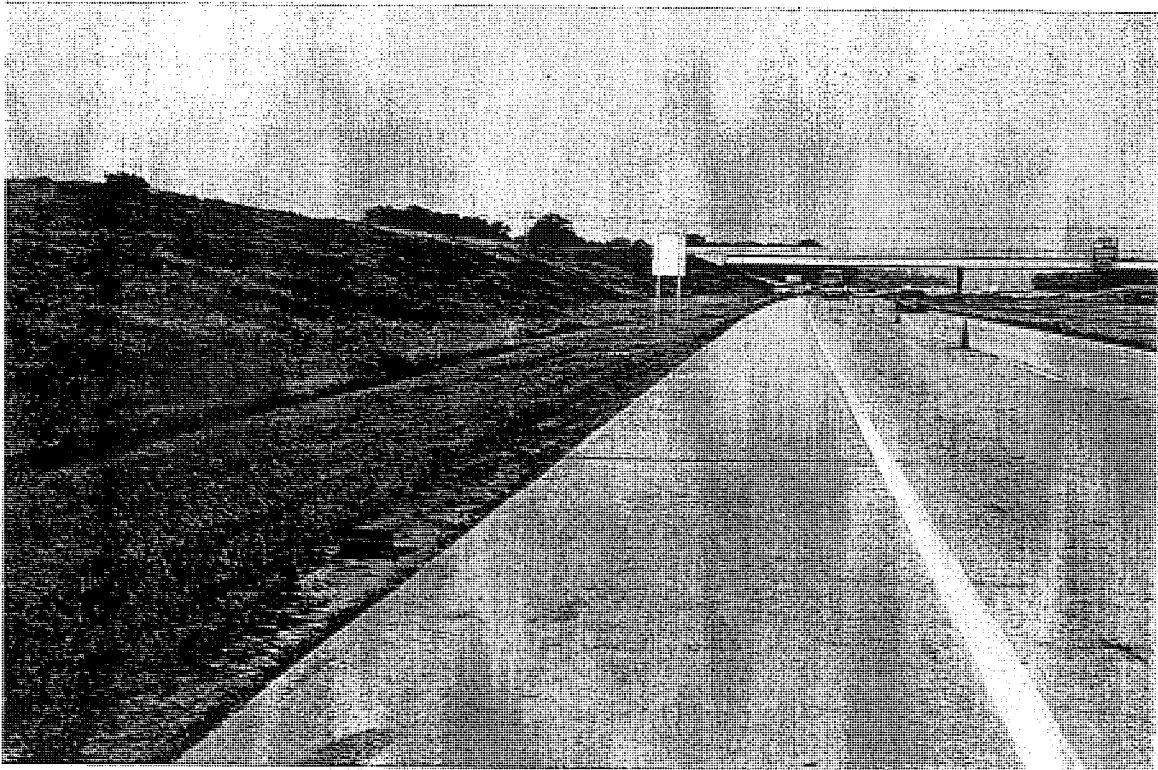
An overview of CSN# 19042-24680A (Section B) EB looking west. This section has 41 ft slabs and concrete shoulders with no intermediate joints.
